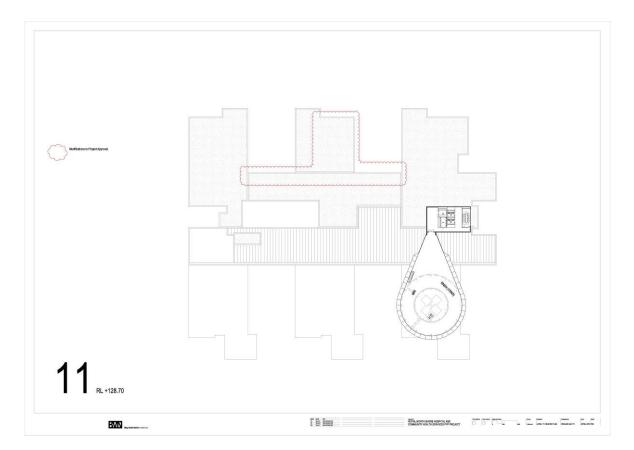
PROPOSED LEVEL 11 PLAN
